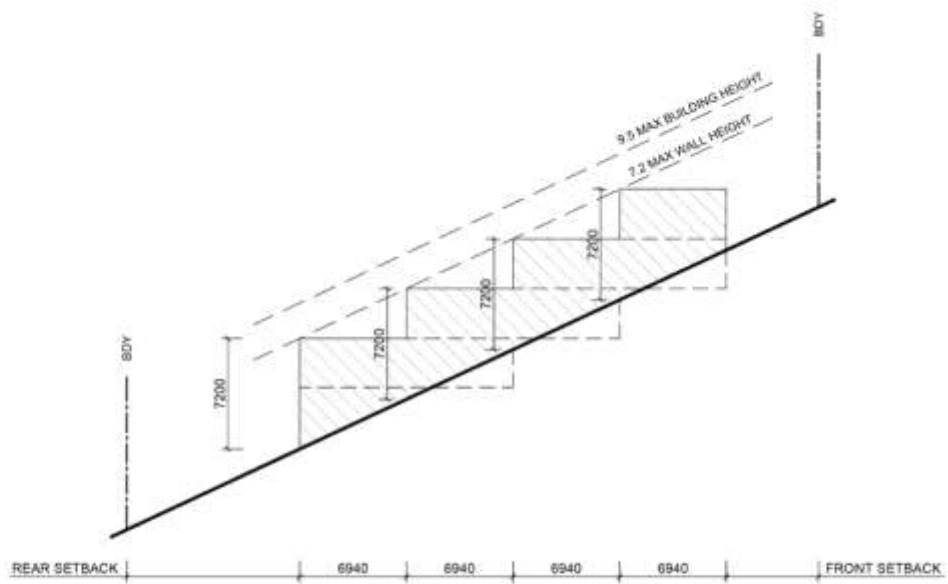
EXISTING MAXIMUM WALL HEIGHT CONTROL ON SITE WITH A 25 DEGREE SLOPE
